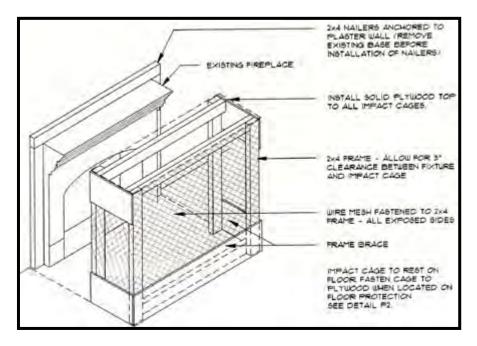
A self-supporting impact cage utilizing wood and wire mesh protects the fireplace. In this project, the long construction process required builders to have visible access to features such as the fireplace. The wire mesh also facilitated monitoring during the lengthy construction. Photo and drawing: Ford Farewell Mills and Gatsch Architects.
